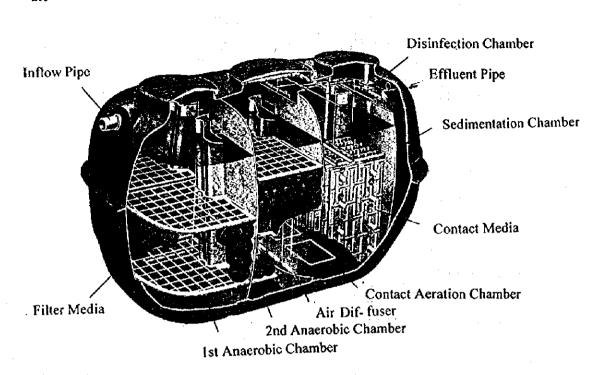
Typical Design of Compact Acrobic Domestic Sewage Treatment Module
